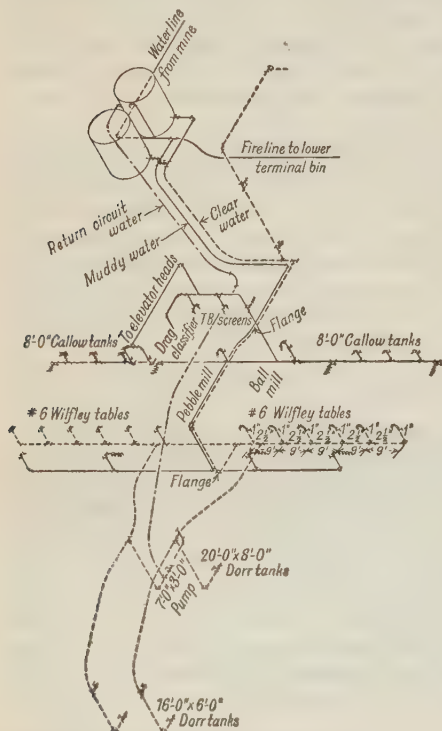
Typical arrangement for lay-out of mill water piping.
